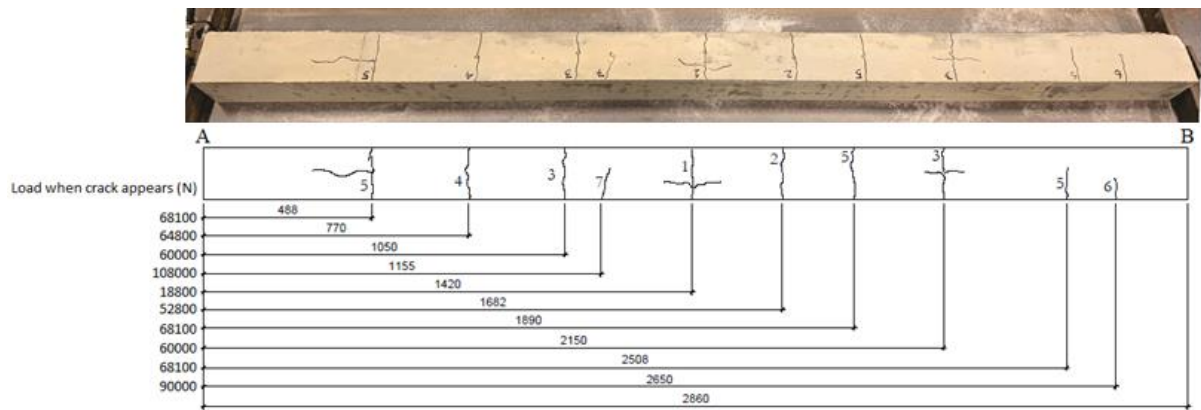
Prism test and crack pattern: #6 steel – specimen 3.
